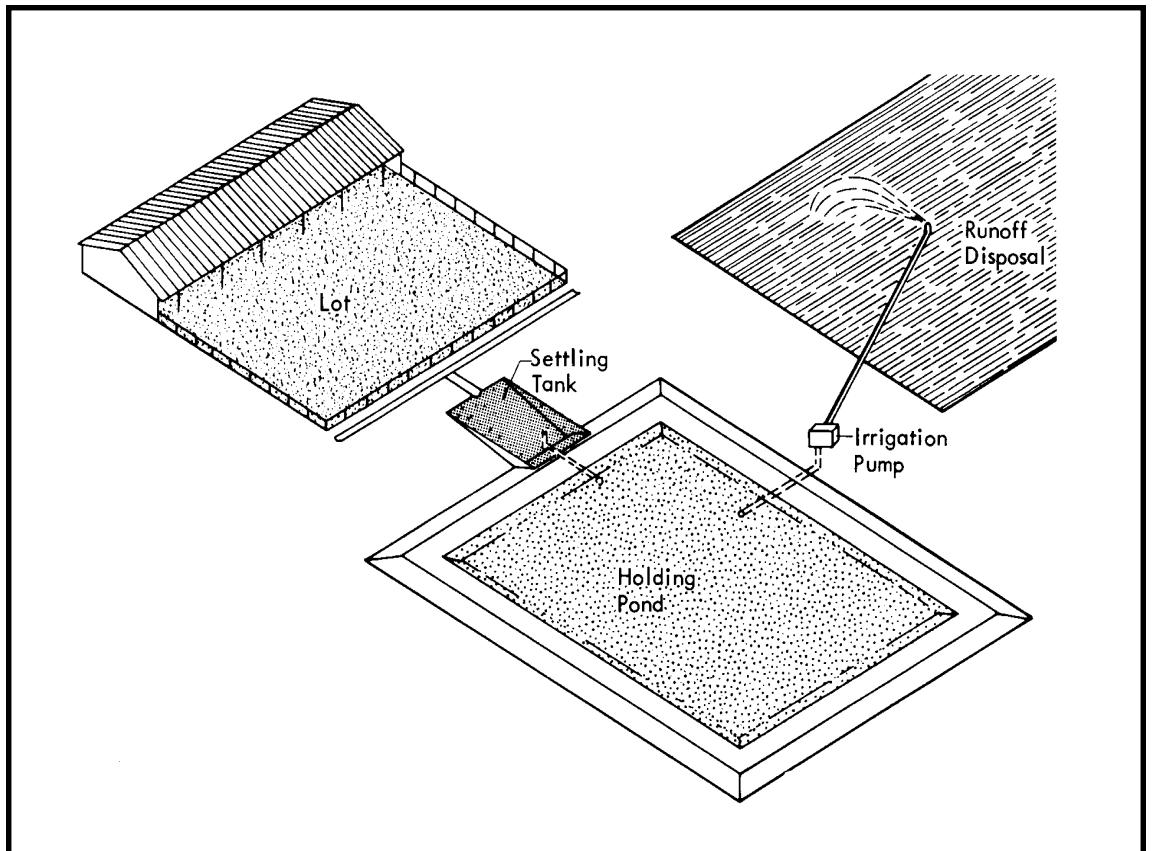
Detention pond for storage of dairy wastewater and livestock yard runoff. Source: *Dairy Housing and Equipment Handbook, MWPS-7, Midwest Plan Service, Ames, Iowa.
